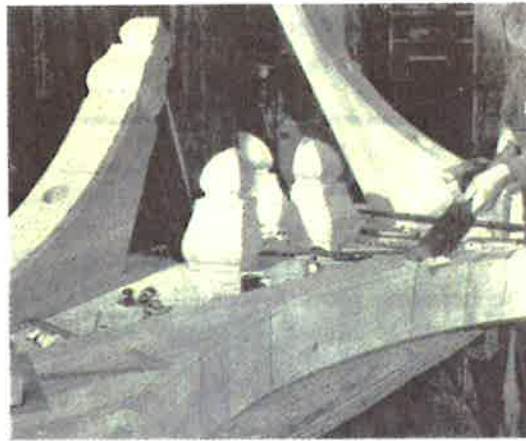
Cutting a chamfer on a laminated corbel (weight-supporting member). This piece will form a part of a wooden truss.
